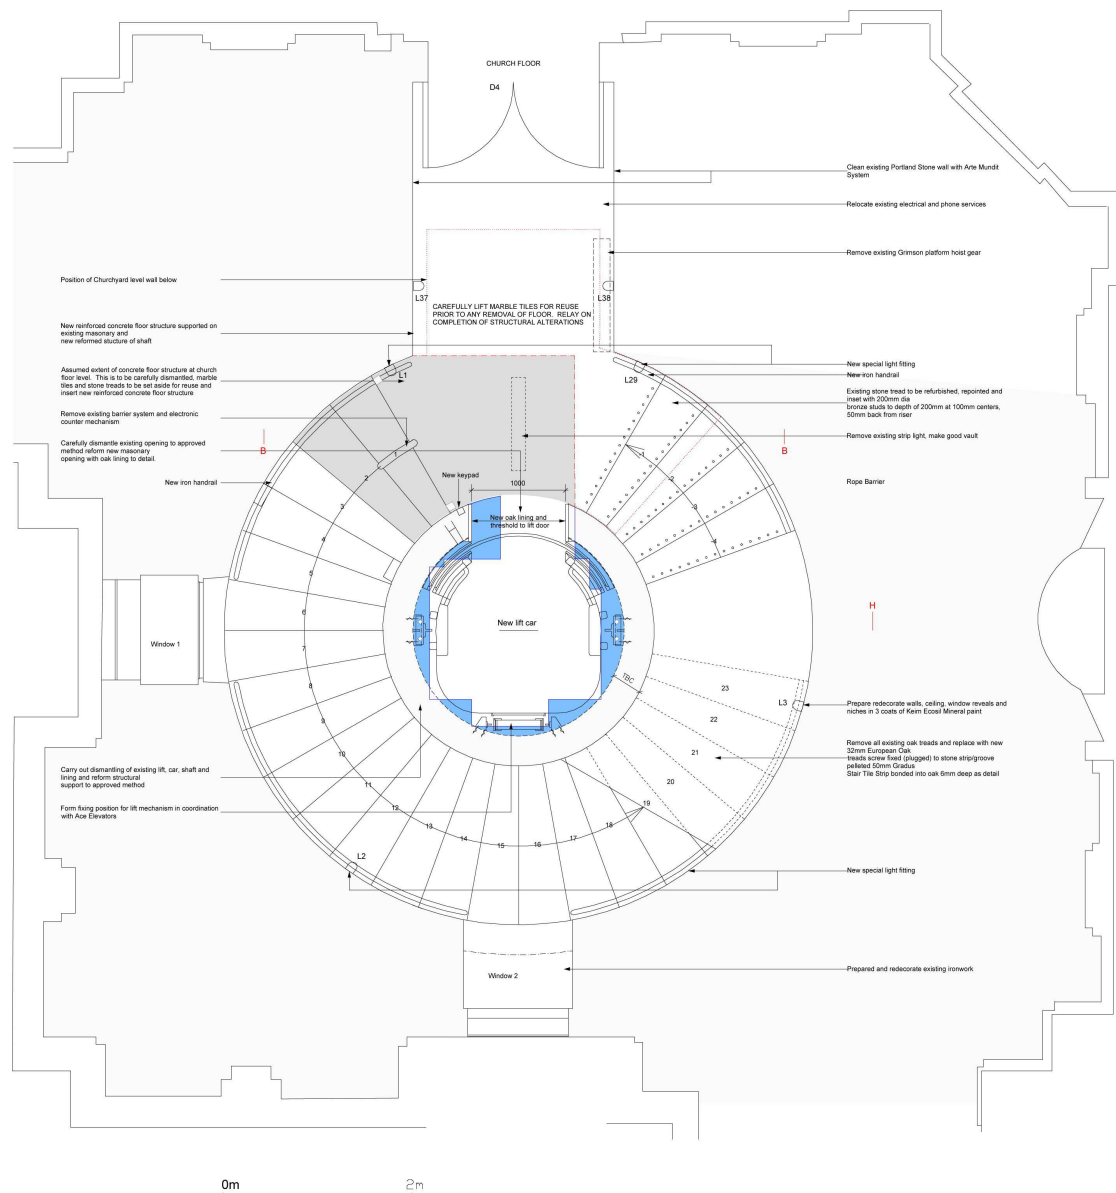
Plan of the main stair and lift at church floor level, showing most of the intended works (some details removed for clarity), from PMT drawing SP170 5168
